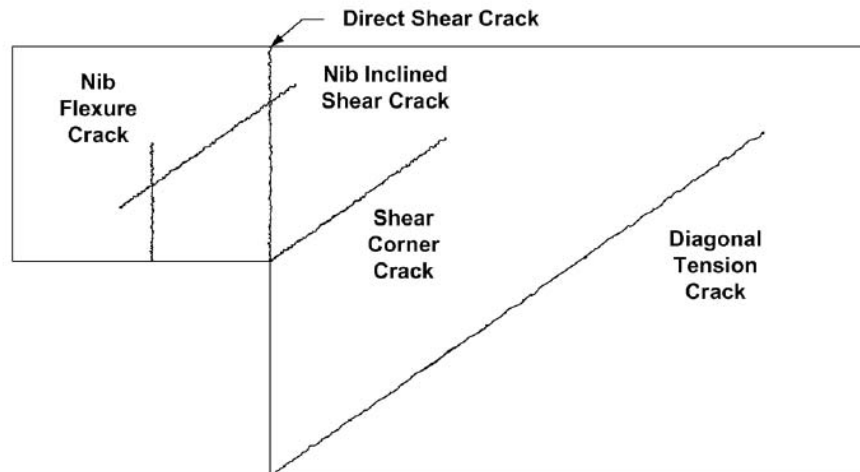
Crack Locations for Dapped End Double Tee Beams, Report No. FHWA NHI 12-049 (p. 9.8.6)
